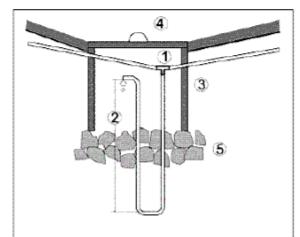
Automatic water trap: (1) T-joint in the piping system, (2) water column, equal to max. gas pressure + 30% security, (3) solid brick or concrete casing, (4) concrete lid, (5) drainage Source: TBW
